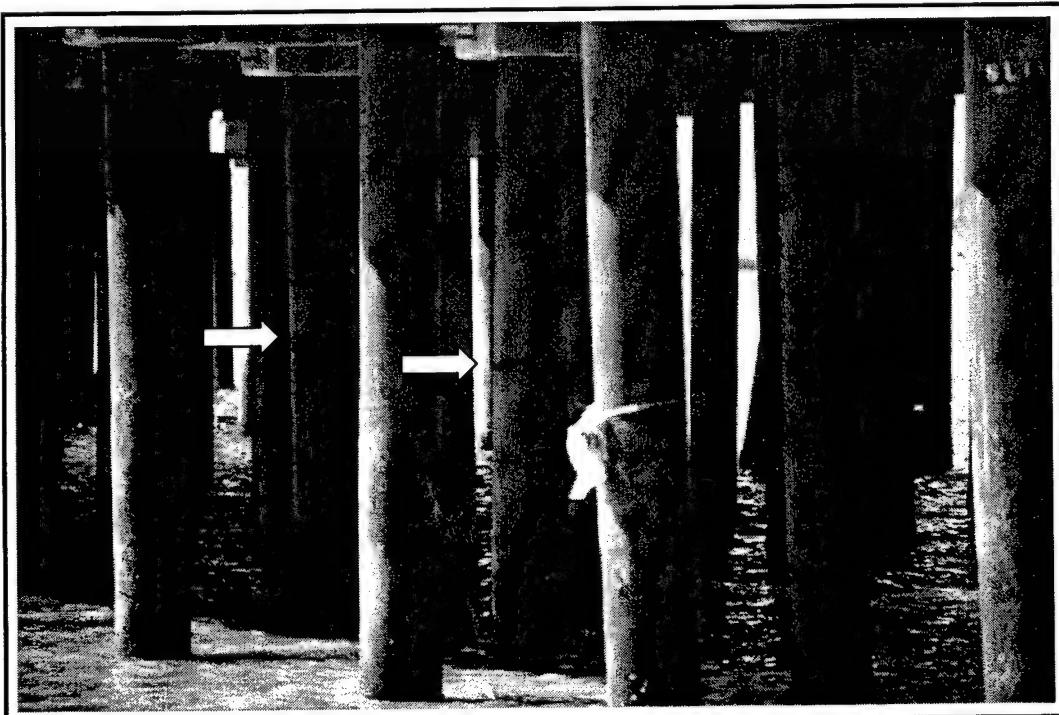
Cracking of steel-cored HDPE piles within 1 year of installation at Tiffany Street Pier.
